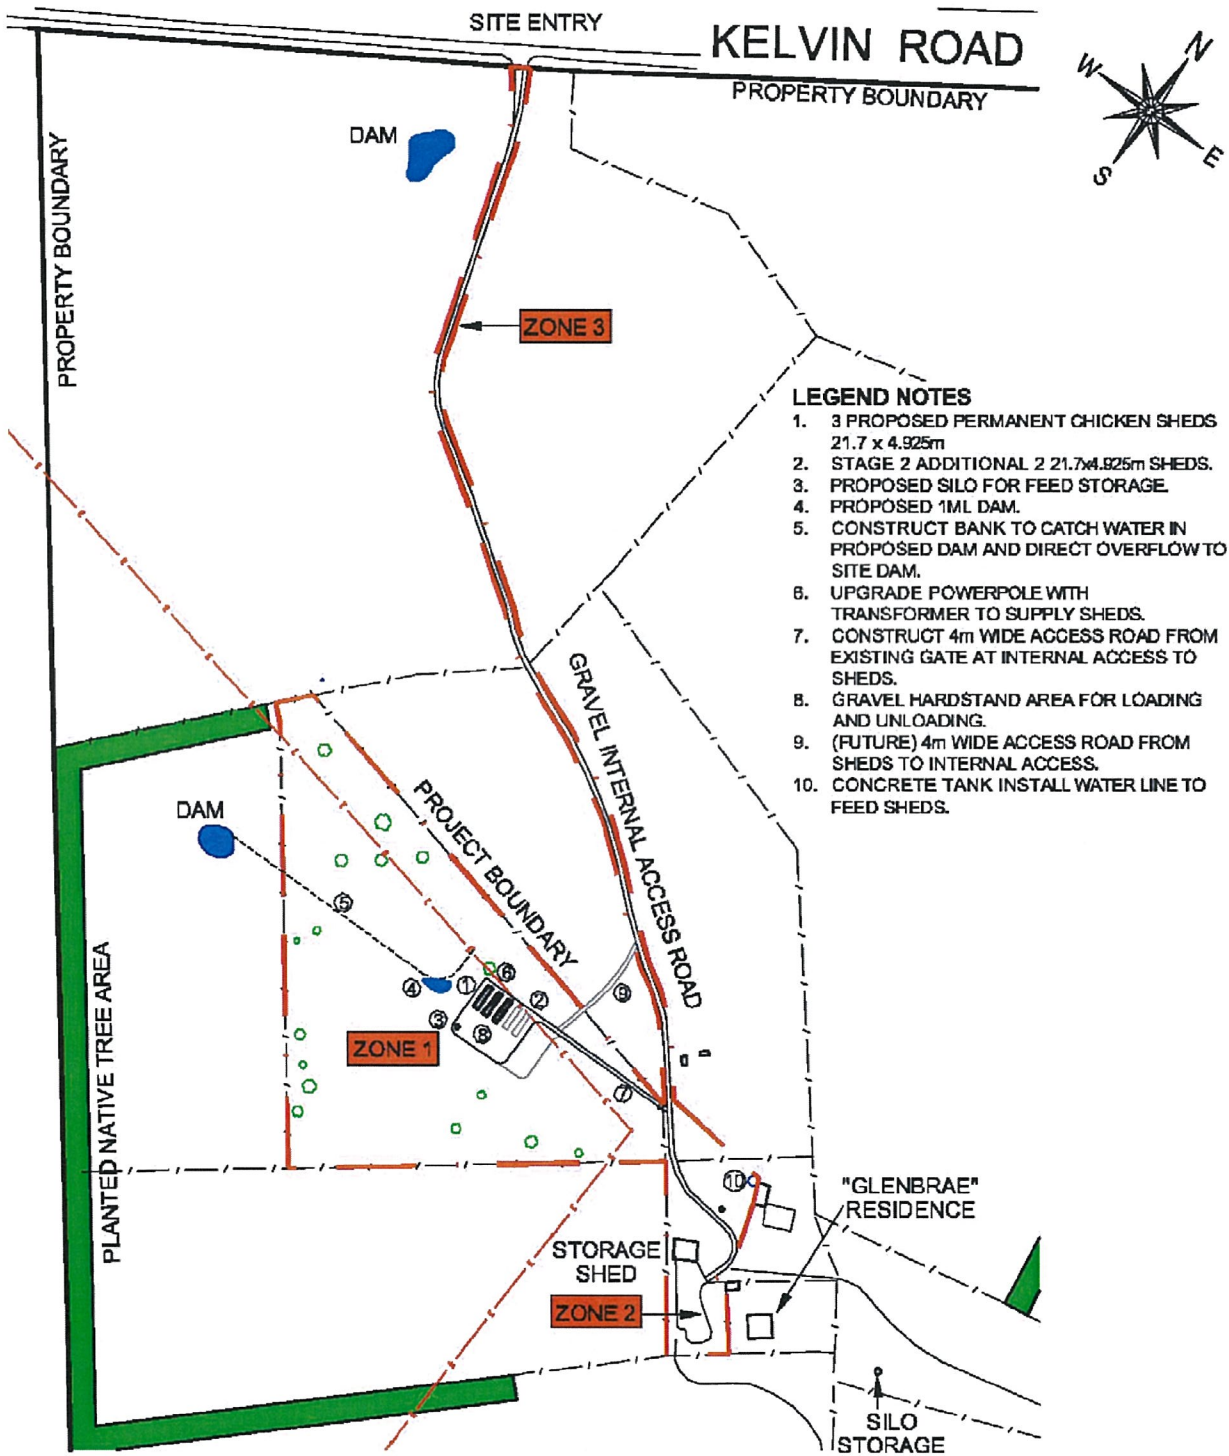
Site Plan – Project Area (refer appendix for scaled plan)
